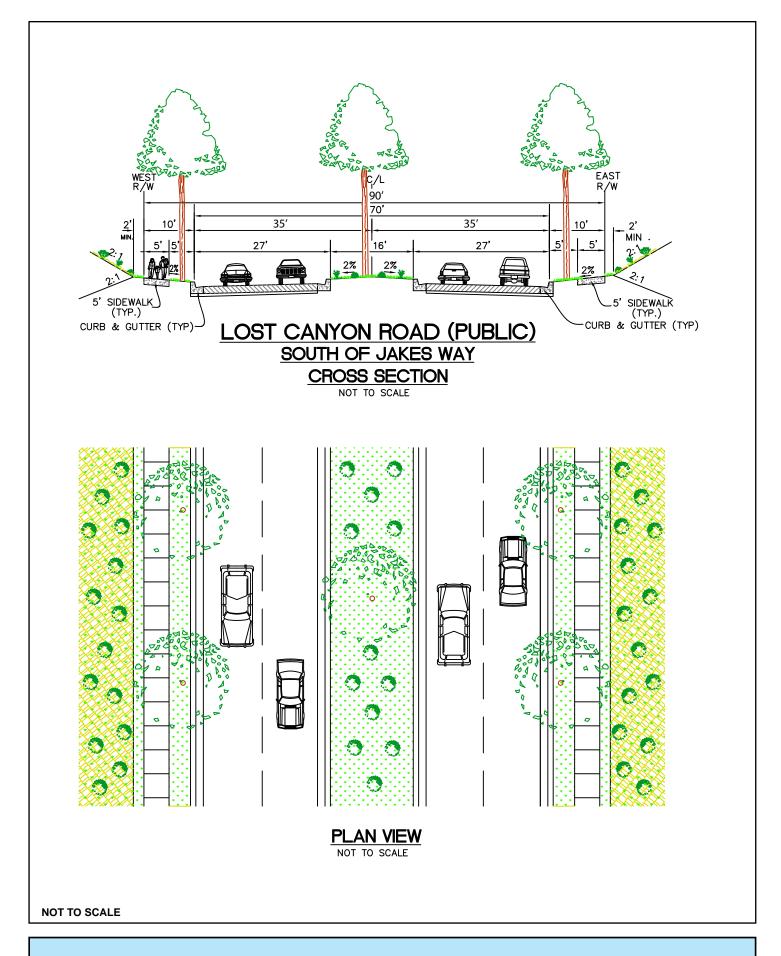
Road Section (Lost Canyon Road South of Jakes Way)
